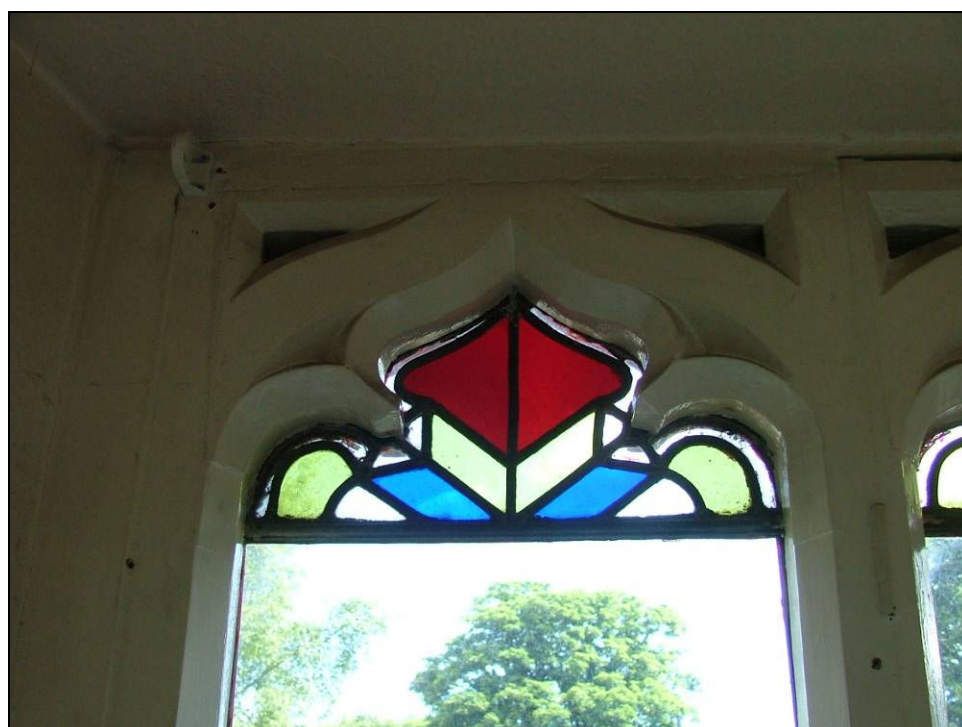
Detail of one of the cusped ogee heads, window in north elevation, first floor
